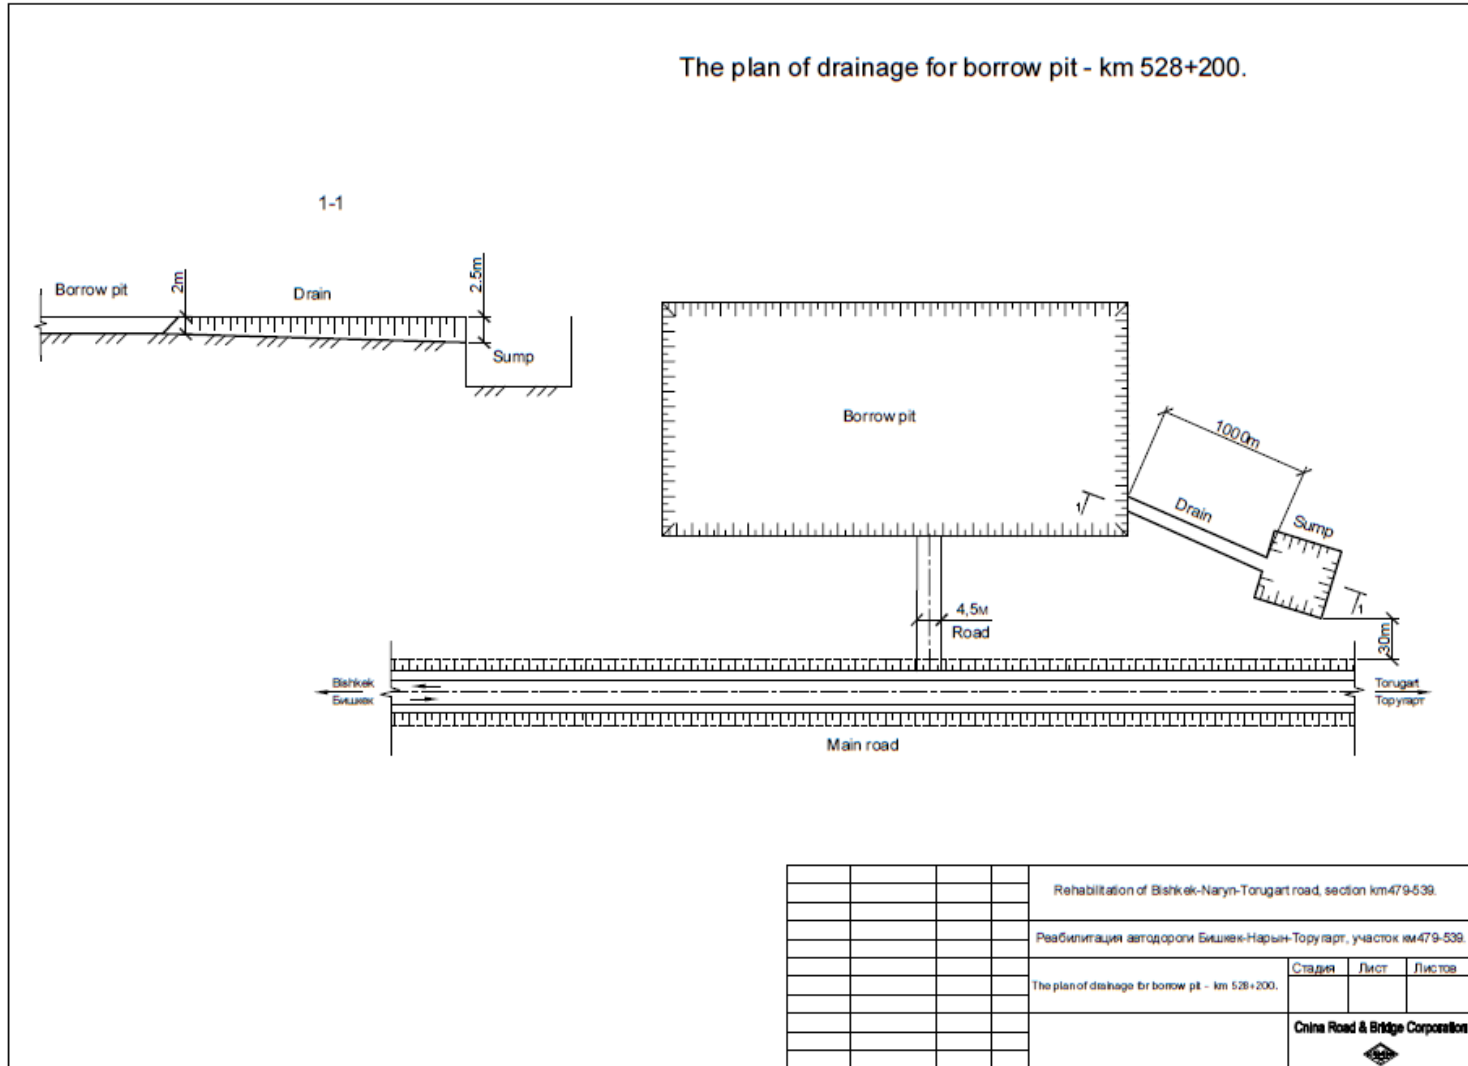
Drainage Plan for Borrow Pits, km 501-539
